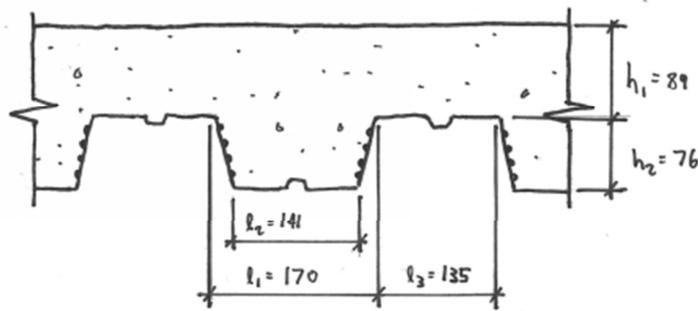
Profiled slab floor assembly, 89 concrete on 76 deck (Canam P-2432)
